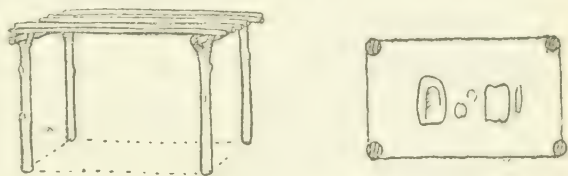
PLAN AND ELEVATION OF MEALING HOUSE.
